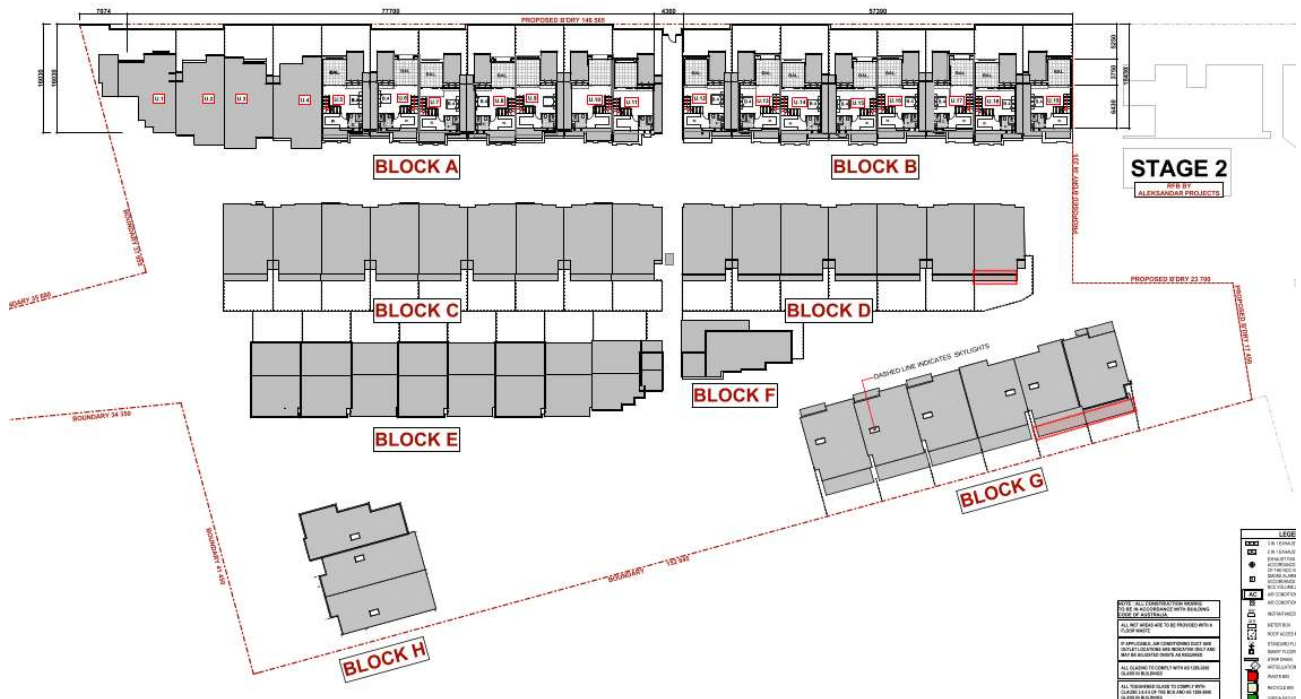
Proposed Second Floor Plan (third storey) for Stage 1 Multi Dwelling Housing.
